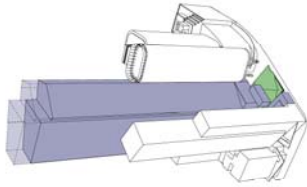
3D model illustrating the proposed envelope within the surrounding proposed context
